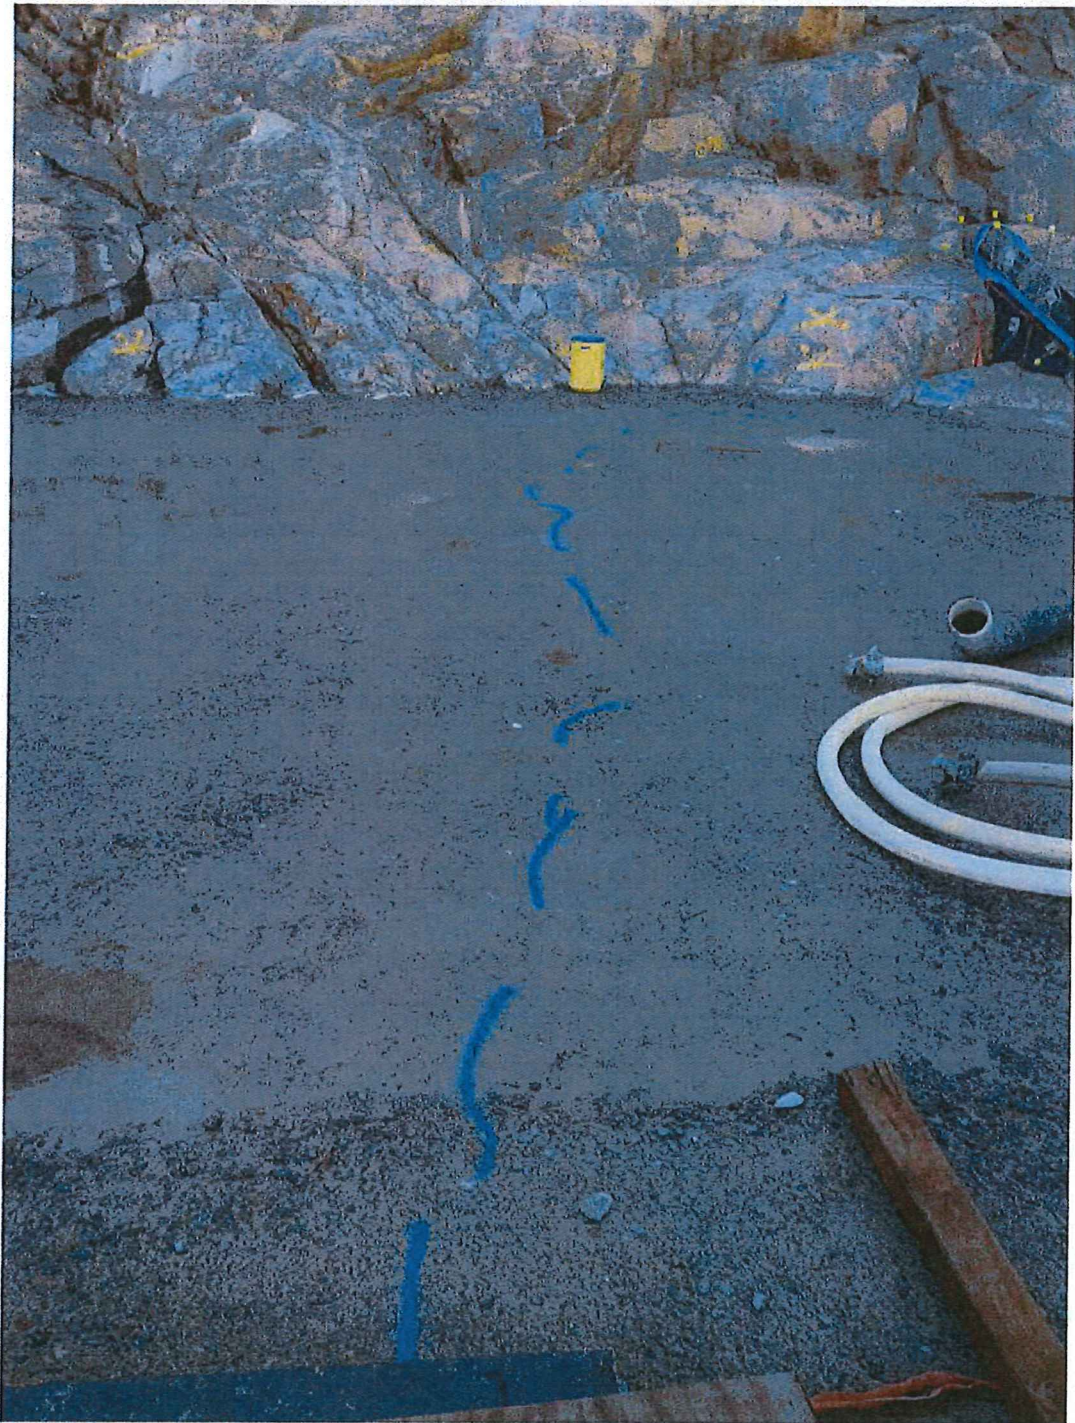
Cross valley crack in Monolith D. Taken looking towards left abutment.
